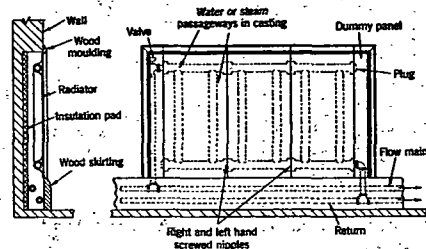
FLAT TYPE PANEL INSTALLED IN WALL RECESS
